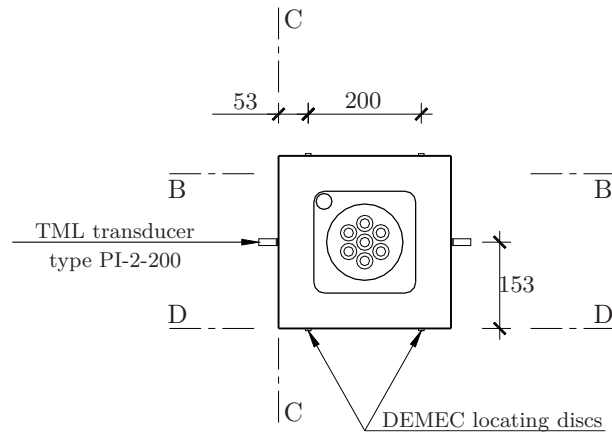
Location of the measuring equipment of specimens P1, P2 and P3 - Section A-A
